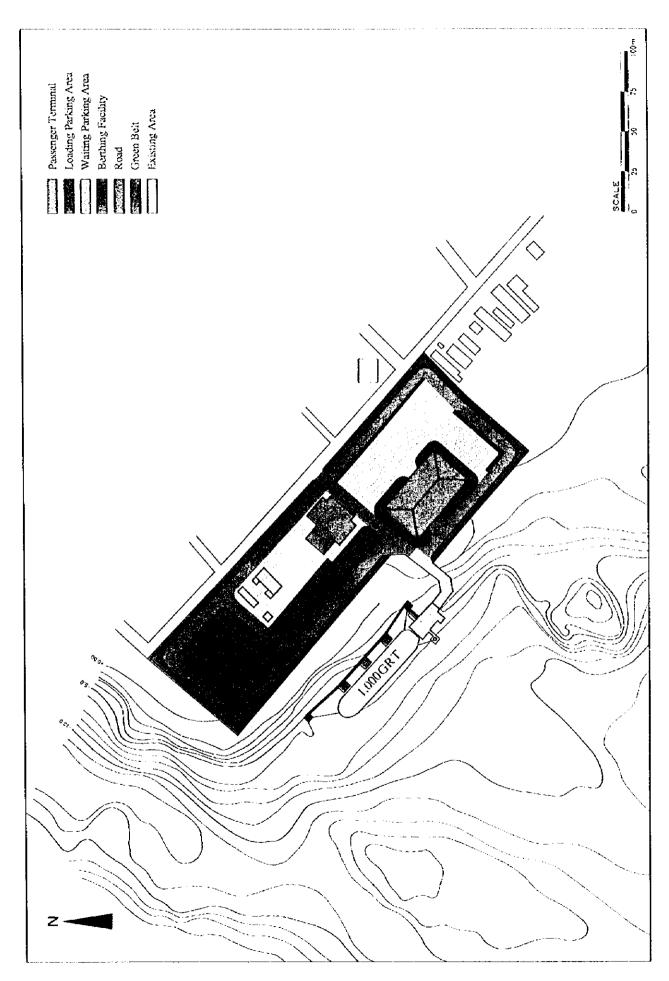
Layout Plan of Labuhan Bajo Ferry Terminal
